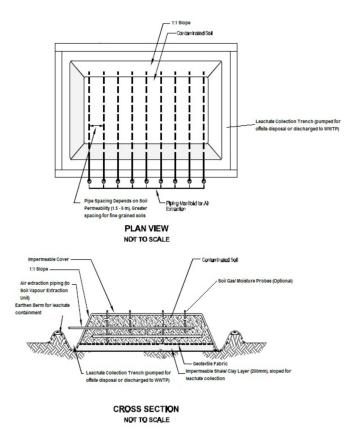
Biopile Construction Schematic – Adapted from USEPA (2017)
